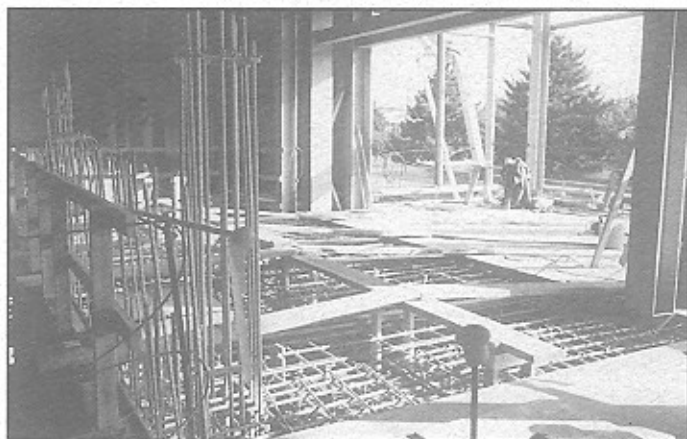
18 inch slab reinforced by GFRP at 9 inches on centre.
